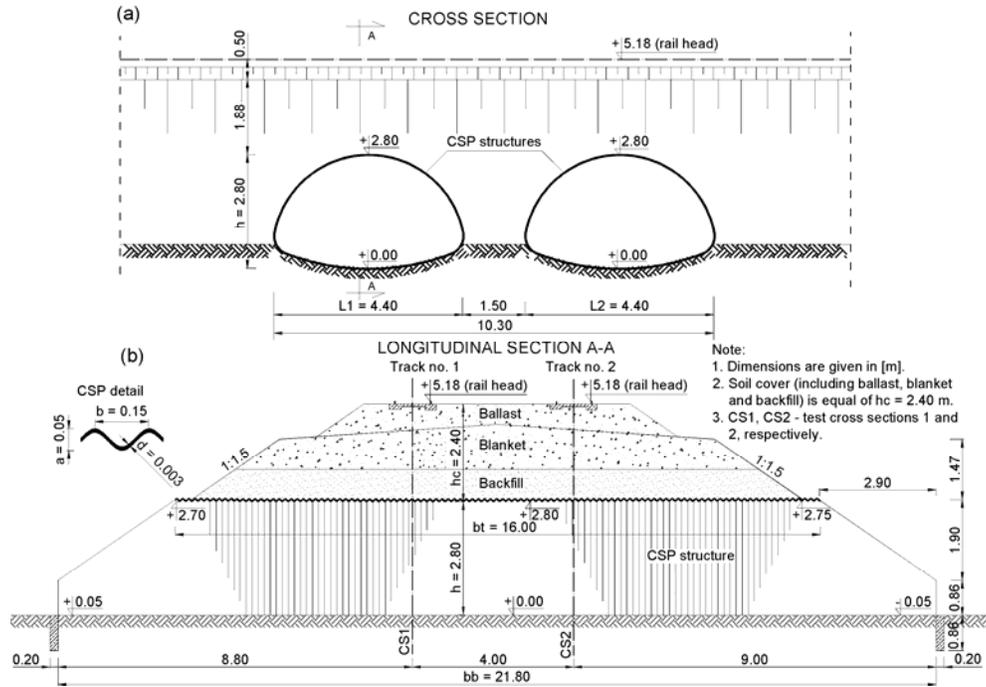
The SSC railway bridge: (a) cross section, (b) longitudinal section A-A.
